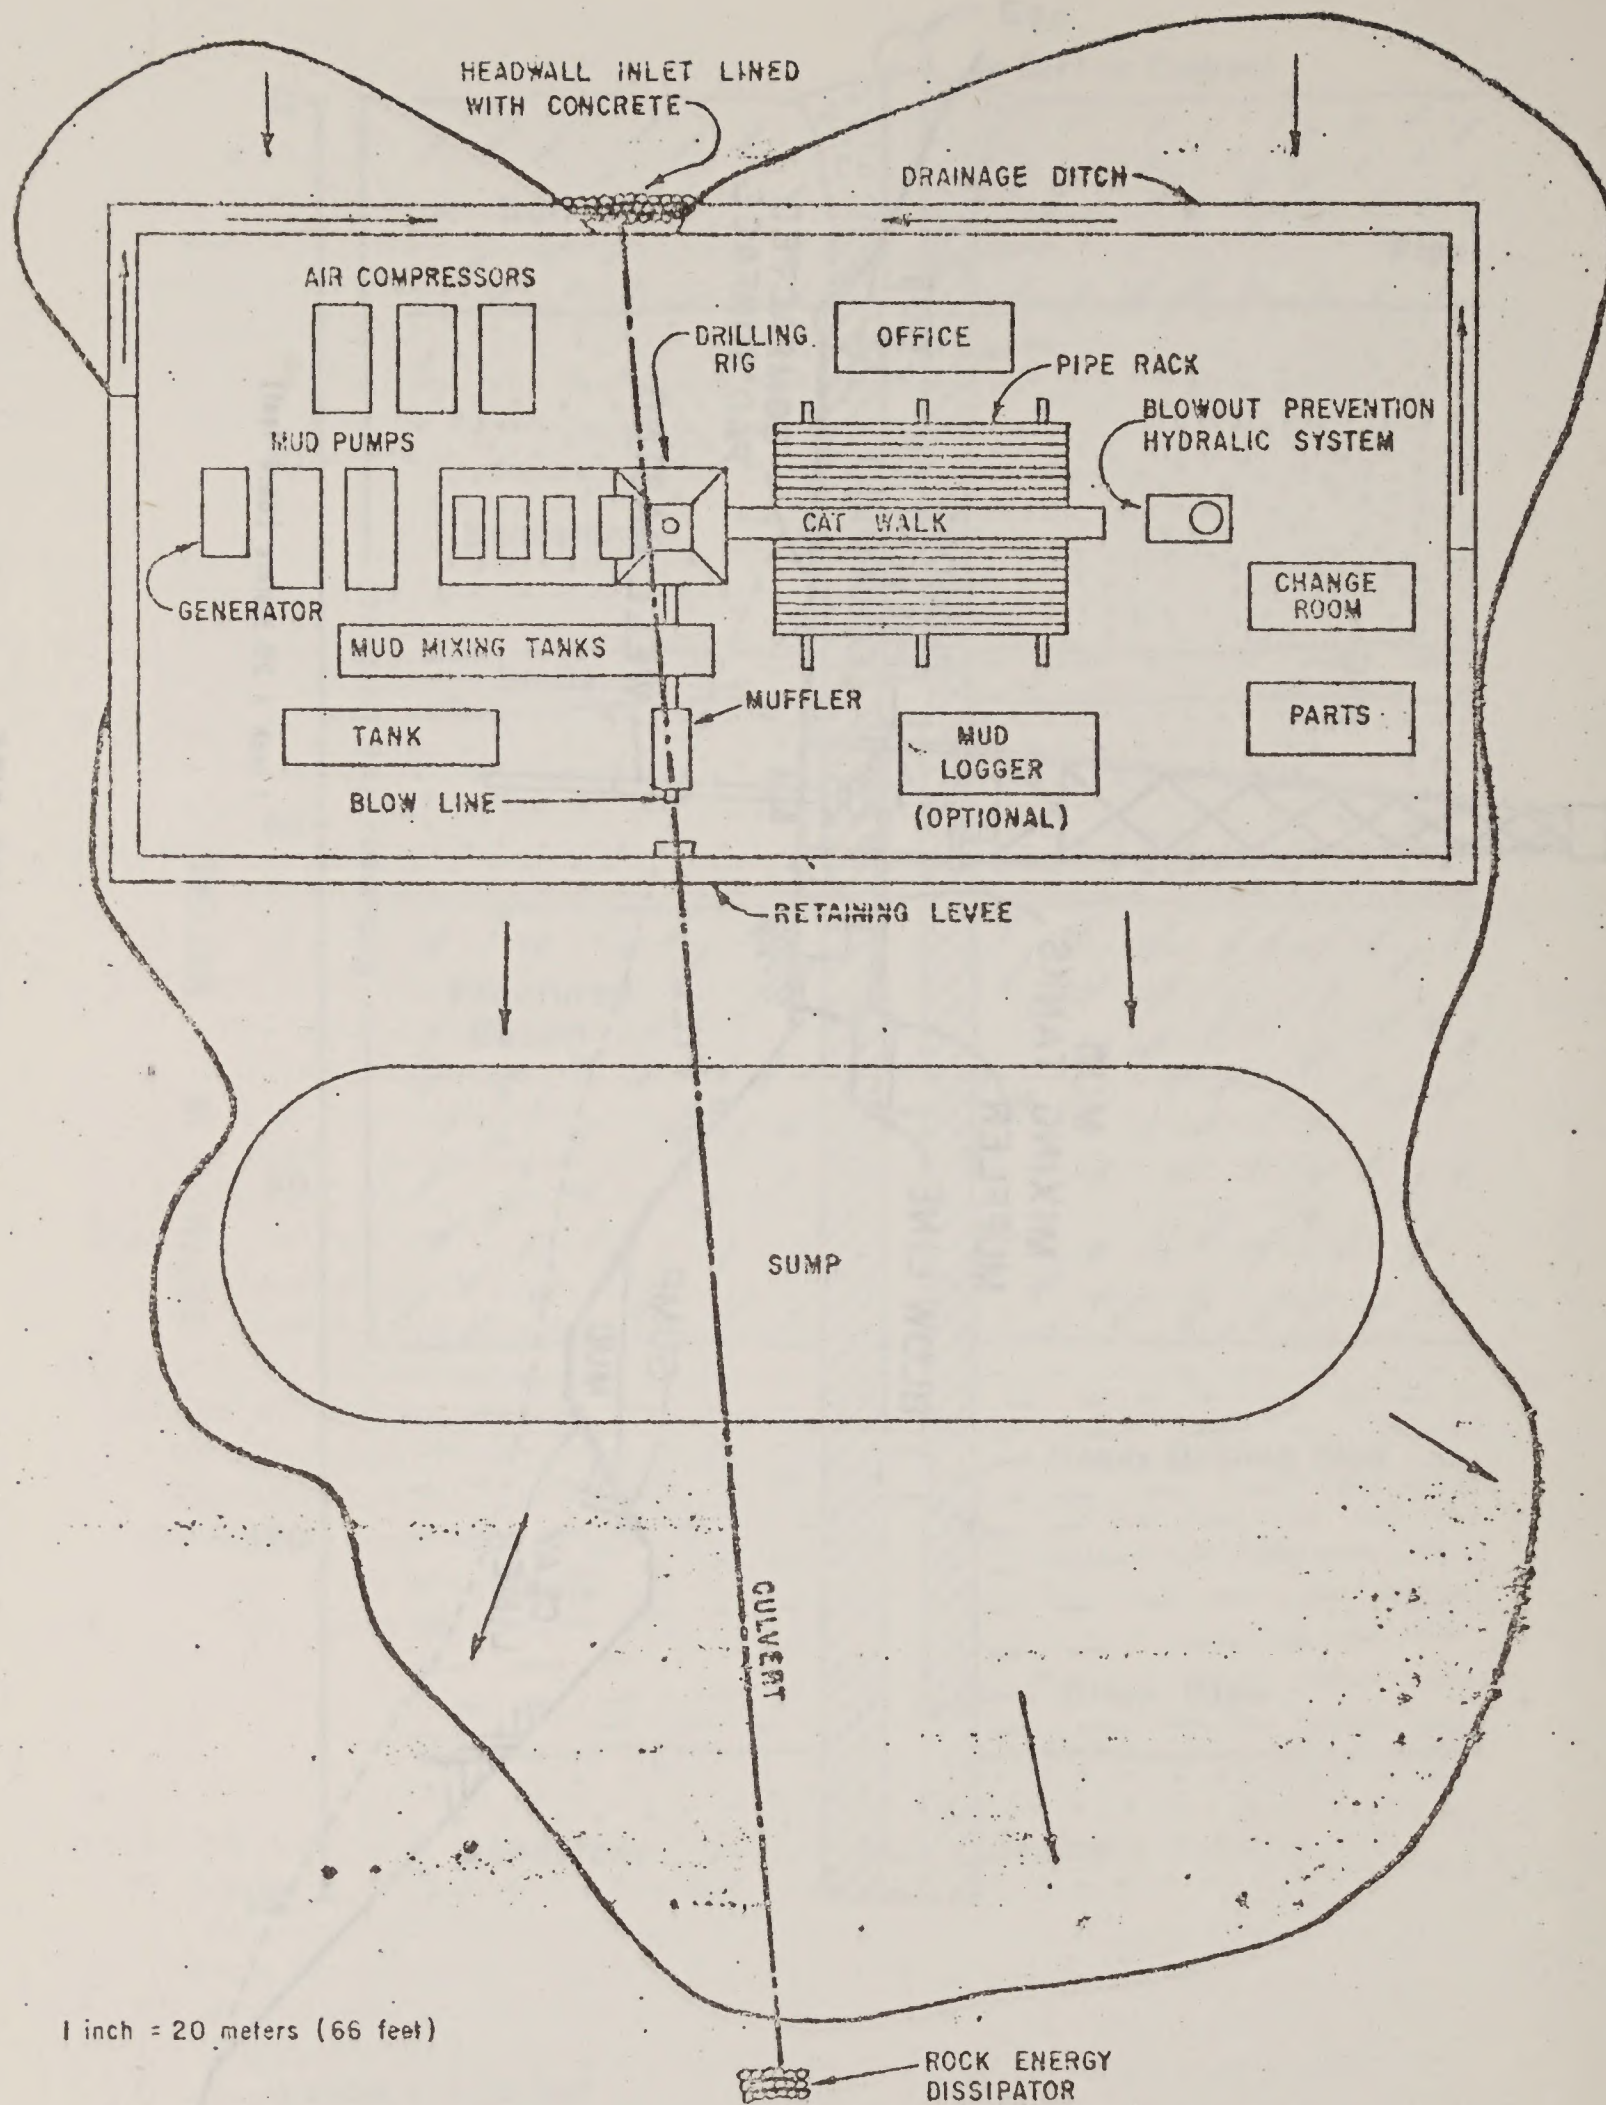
TOP VIEW OF A TYPICAL DRILLING SITE
